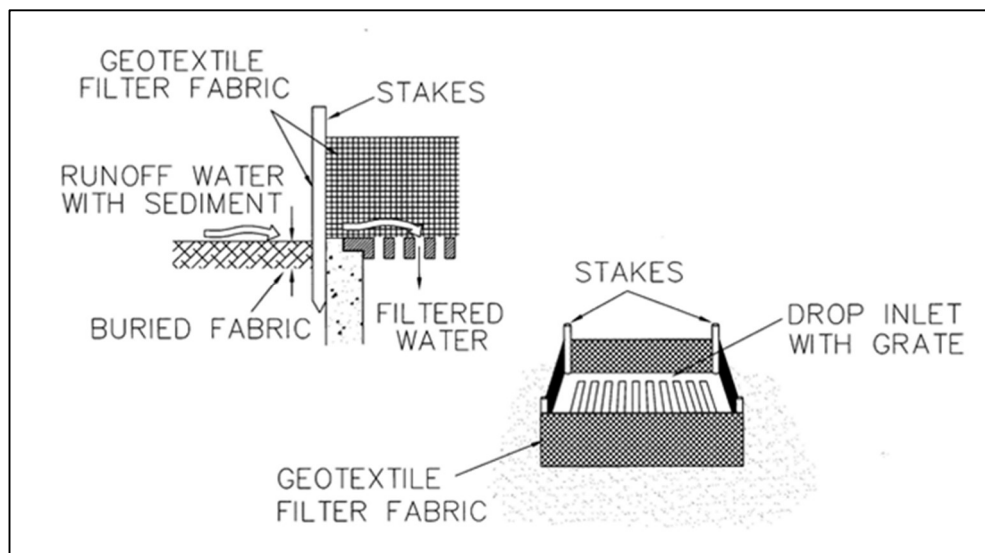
Geotextile Filter Fabric Drop Inlet Sediment Trap (NTS)
